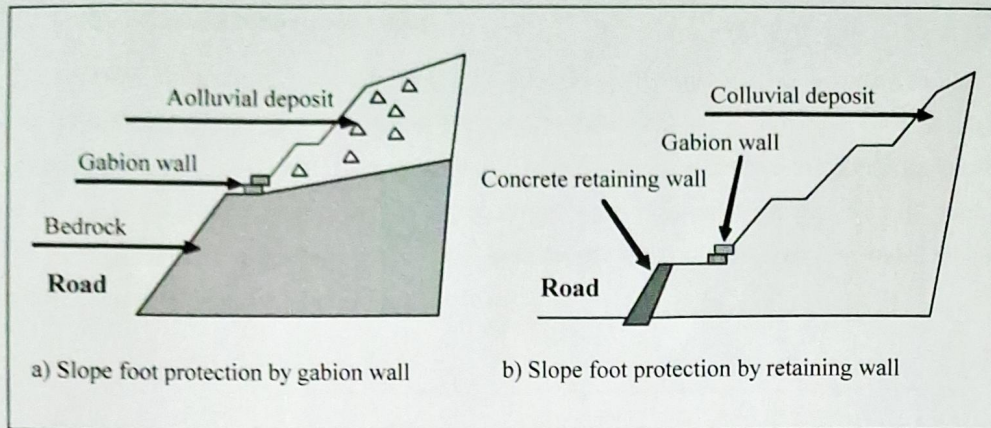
Schematic Diagram of Slope Foot Protection
